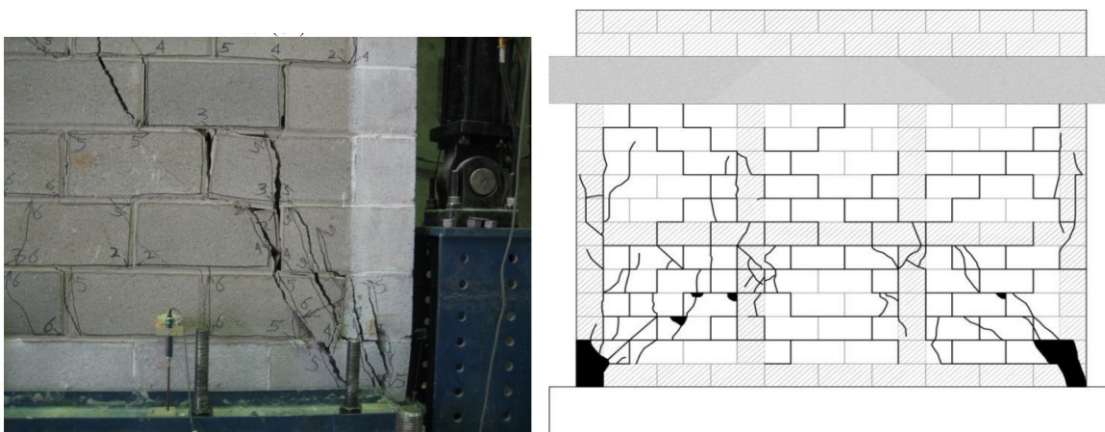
Crack pattern in PG wall tested by Minaie (2009)
